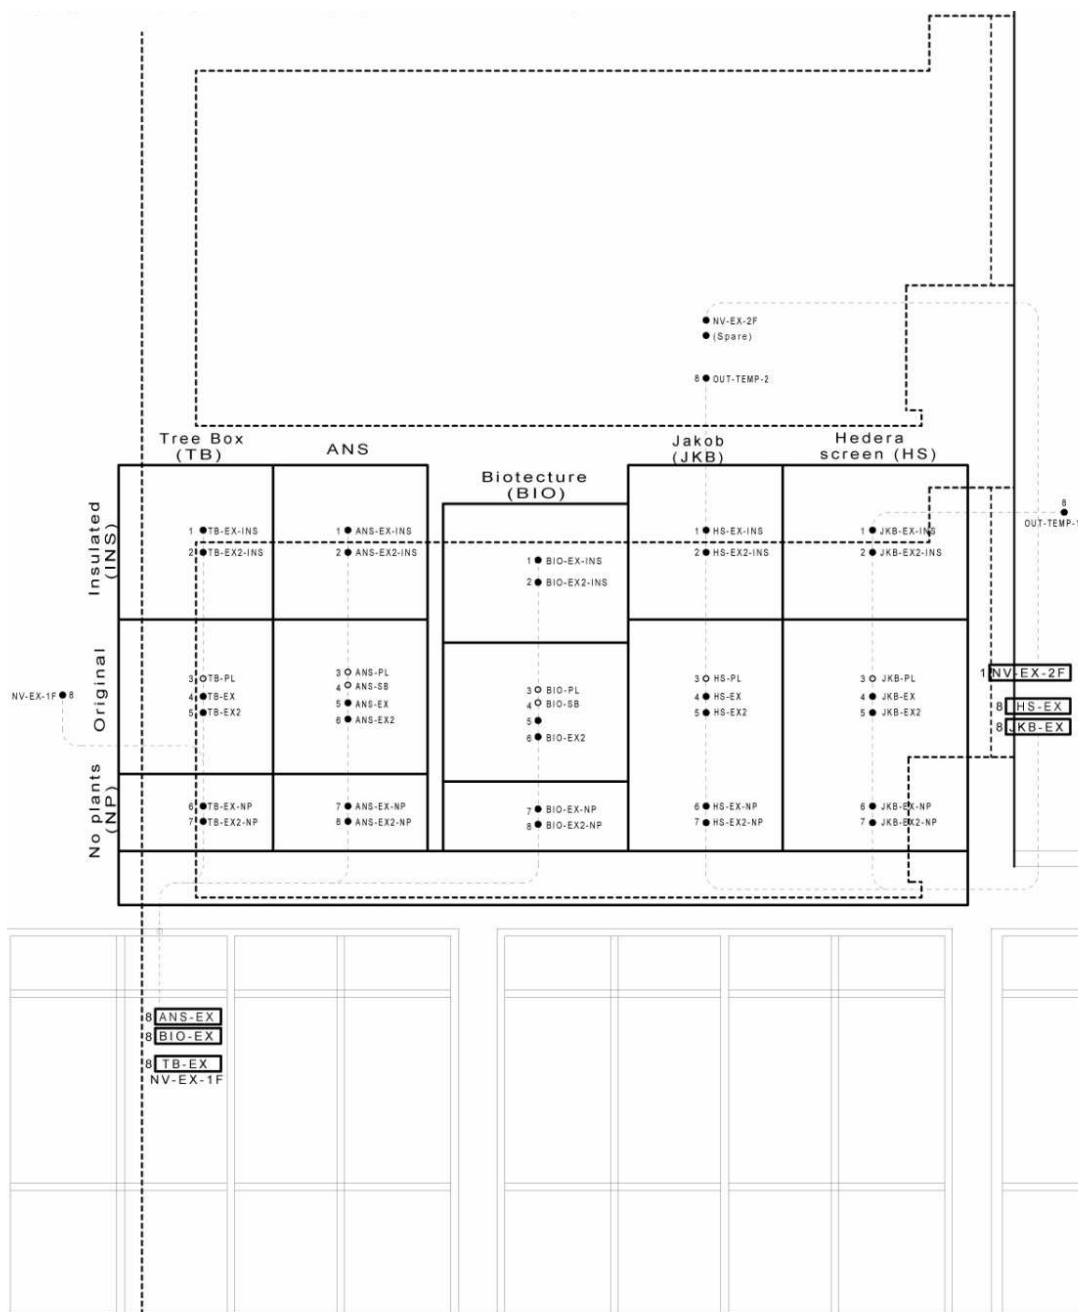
Elevation plan of the monitored section of the wall, showing locations of thermocouples measuring external wall surface temperatures
